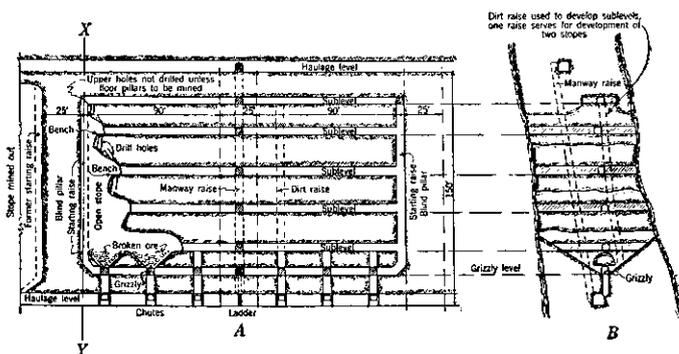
Sublevel stoping in moderately firm and hard ore: A, Longitudinal vertical section; B, section X-Y, looking toward stope face
